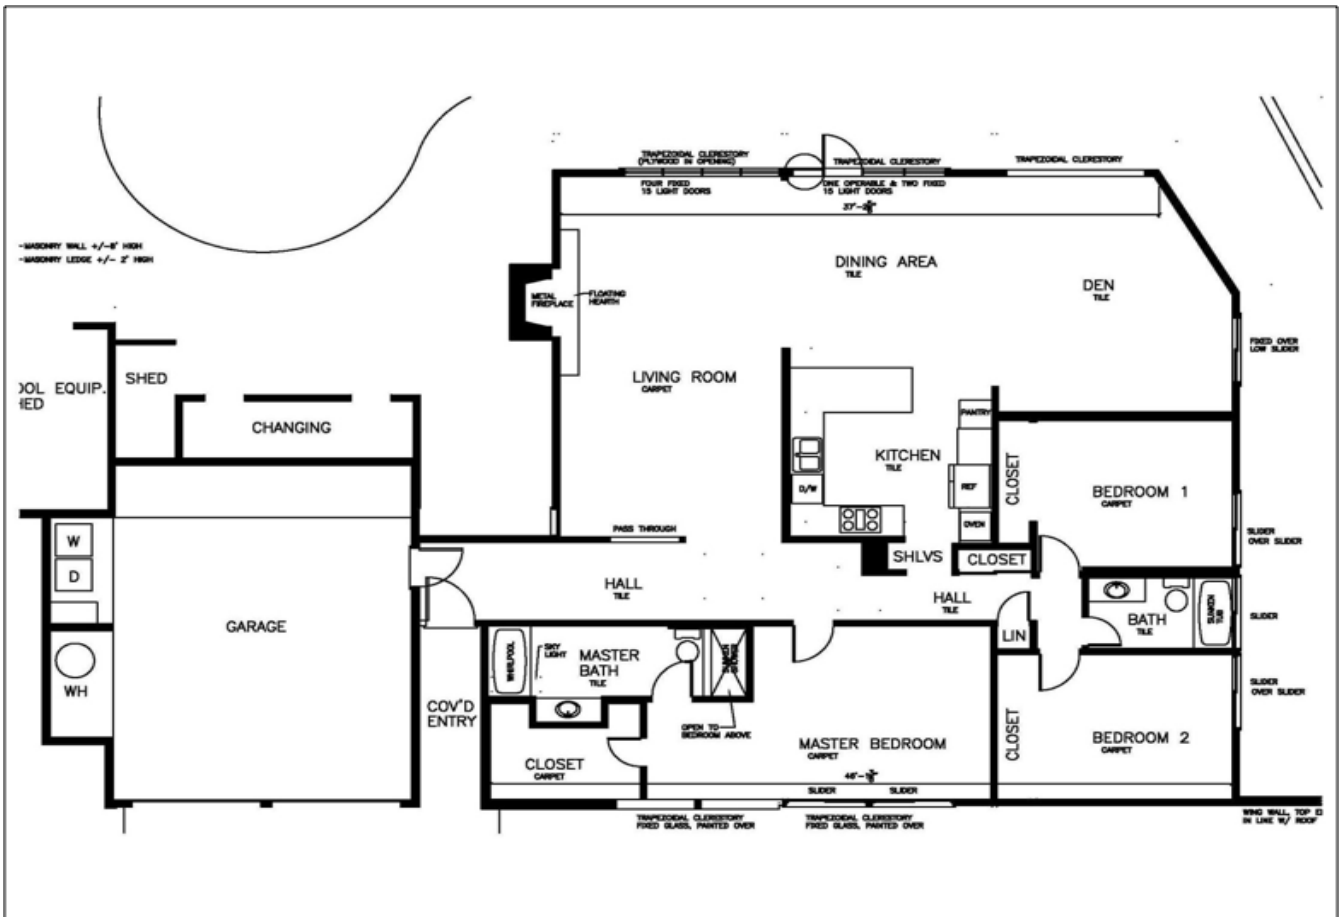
ReVISION House™ Las Vegas Existing Plan
